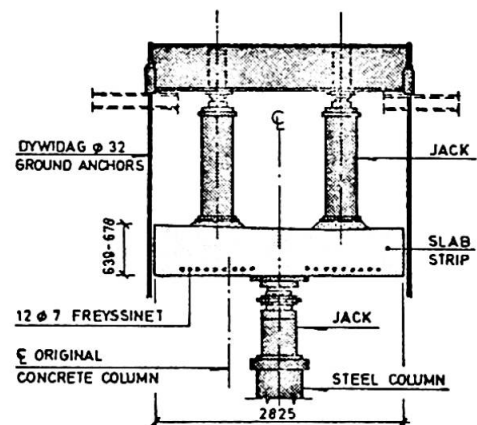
Slab strip. Cross section at midspan. Load arrangement
